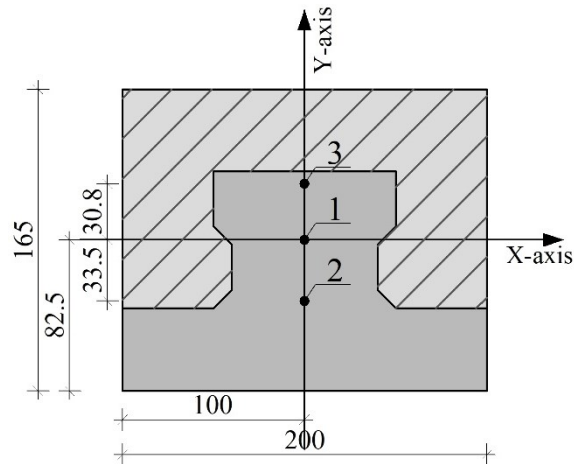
Centres of gravity: 1- composite section, 2- precast, 3- concrete topping
